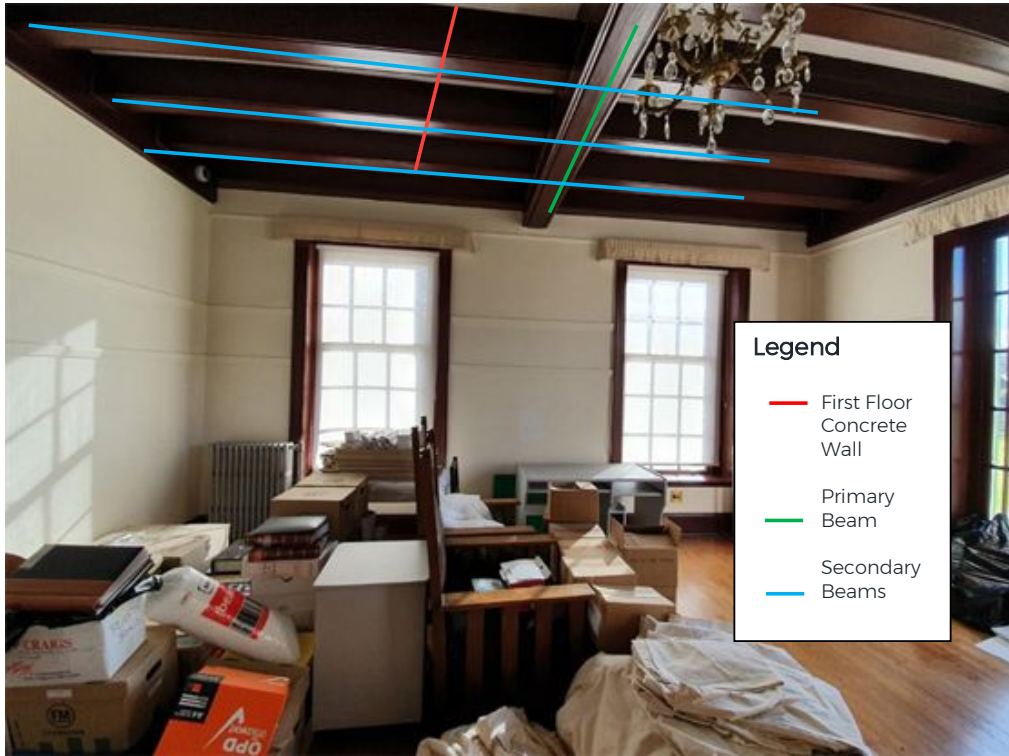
Location of First Floor Concrete Wall Shown from Ground Floor
